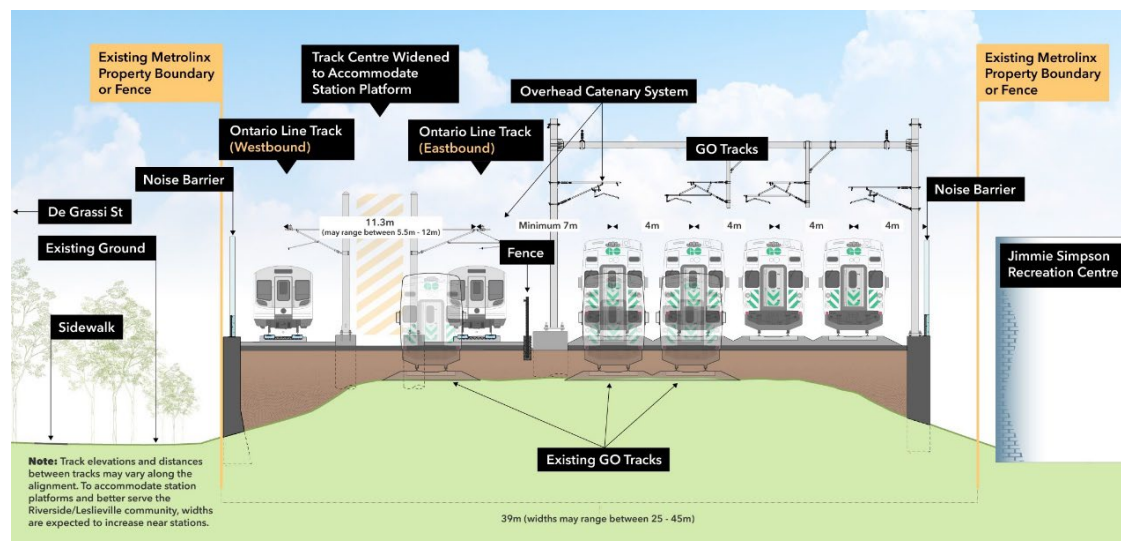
Cross section north of Queen Street at the north end of Jimmie Simpson Recreation Centre (Source: Metrolinx)
